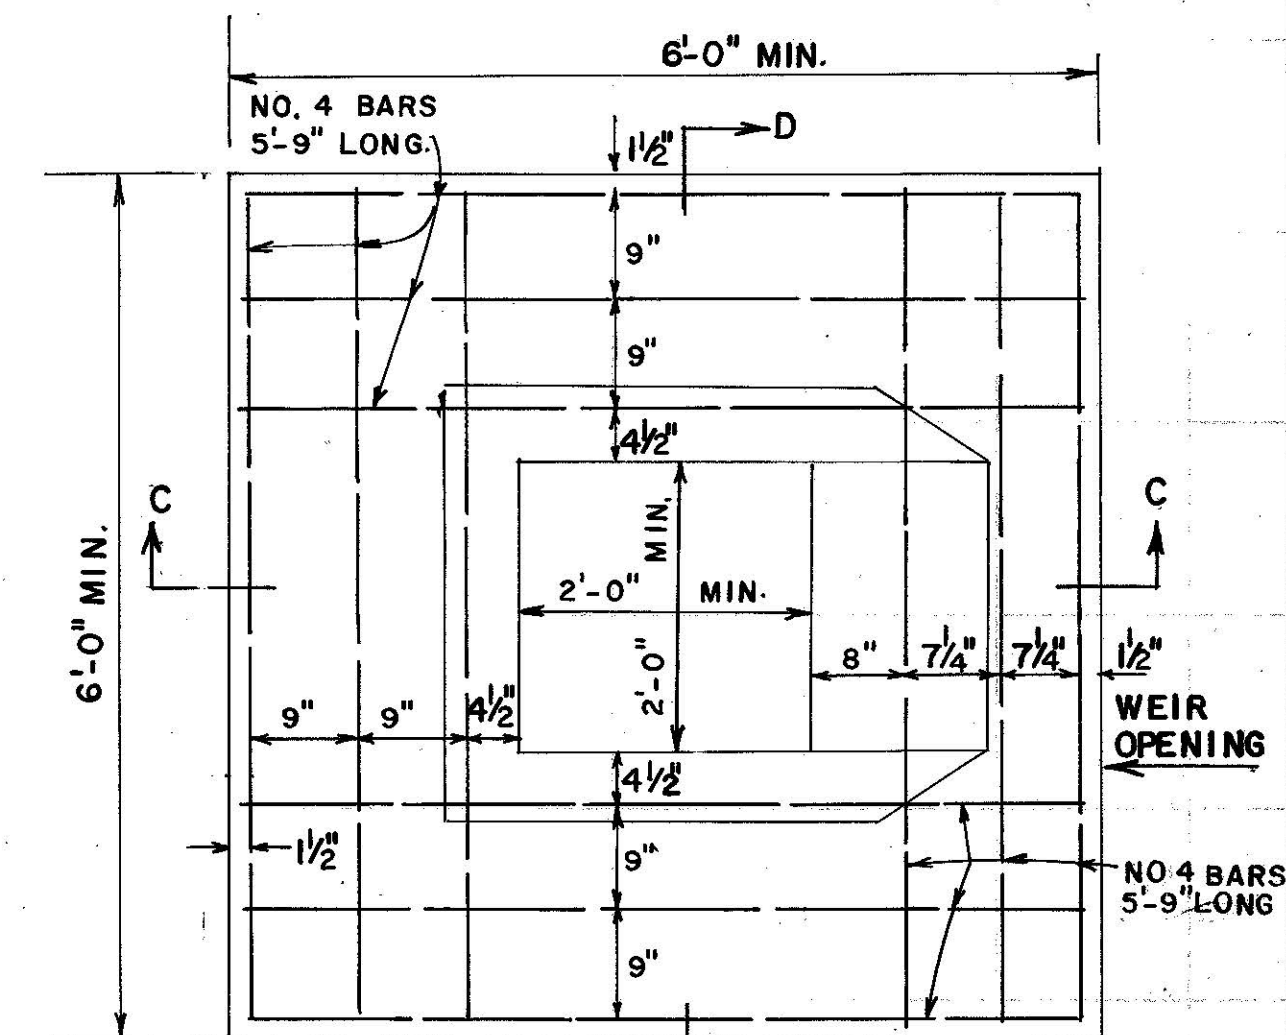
DETAILS OF DROP INLET WITH DOUBLE WEIR OPENING
